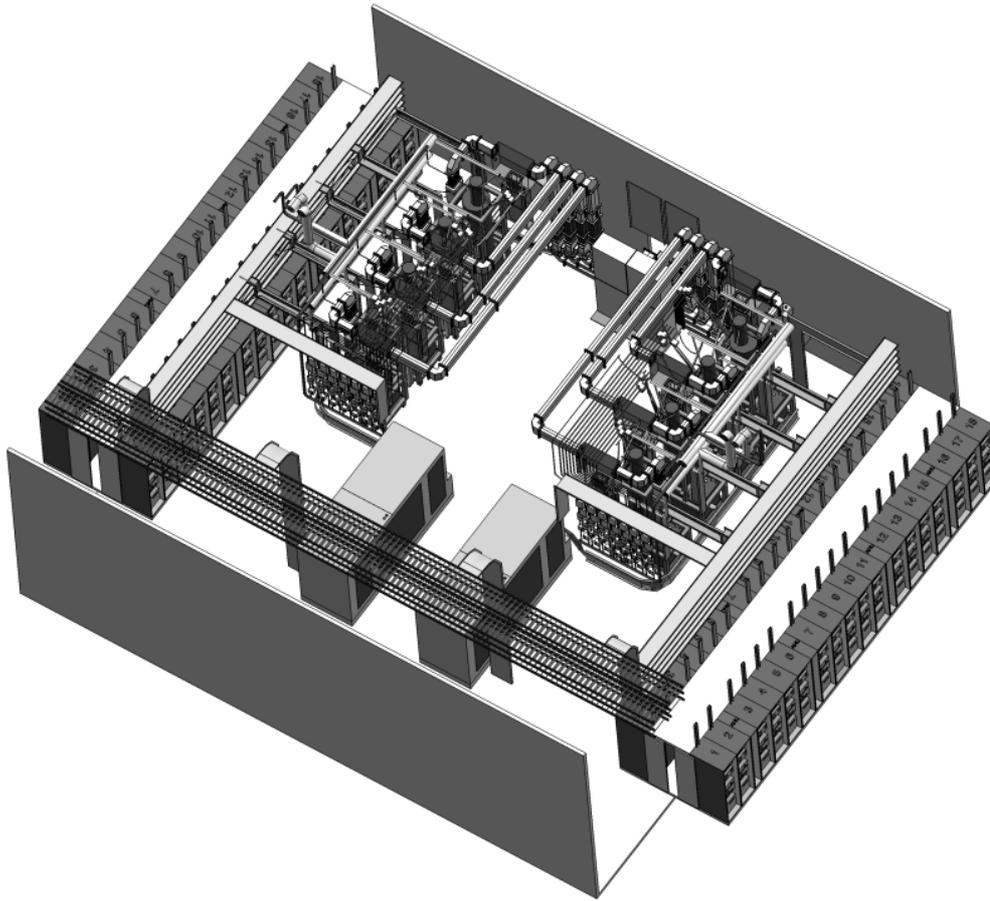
Gallery walls and equipment that is installed after the support structure (ESS-0006436.7)
